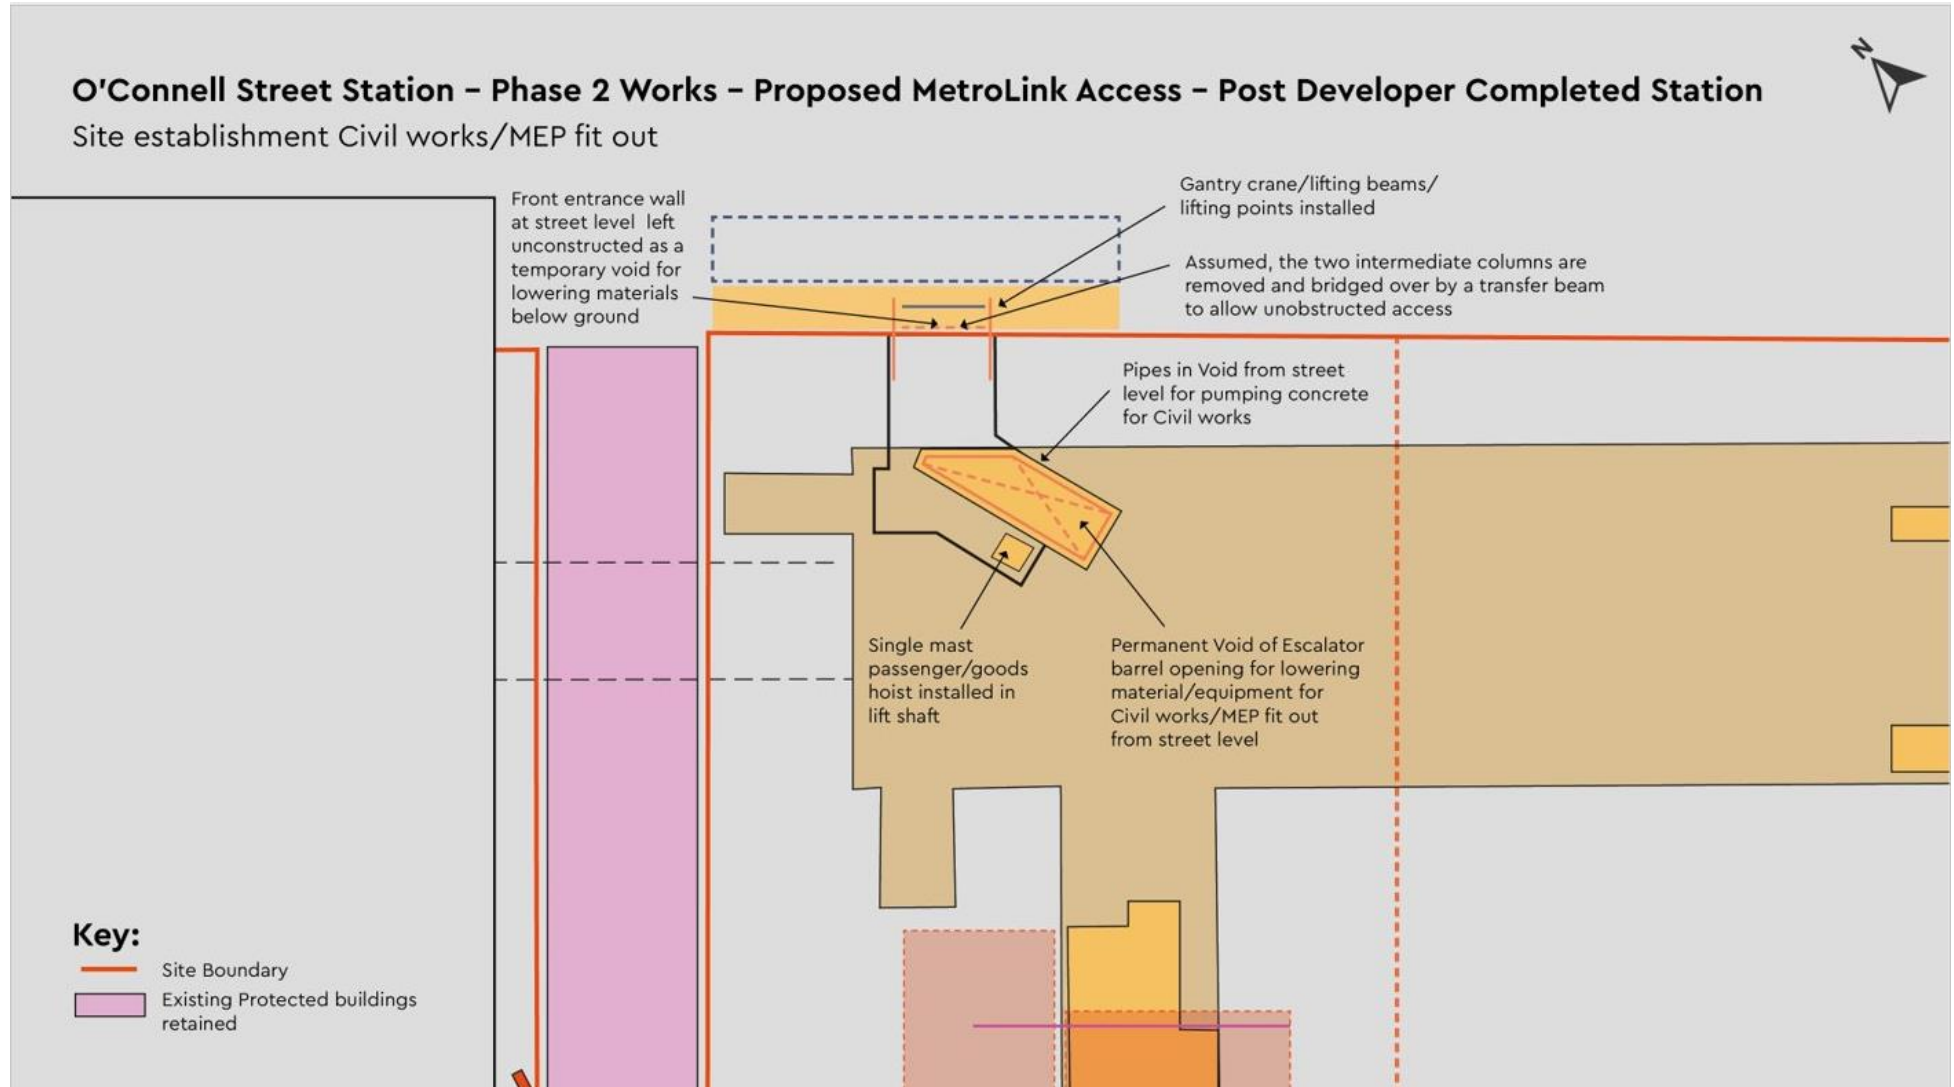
O'Connell Street – Site establishment Civil works/ MEP fit out
